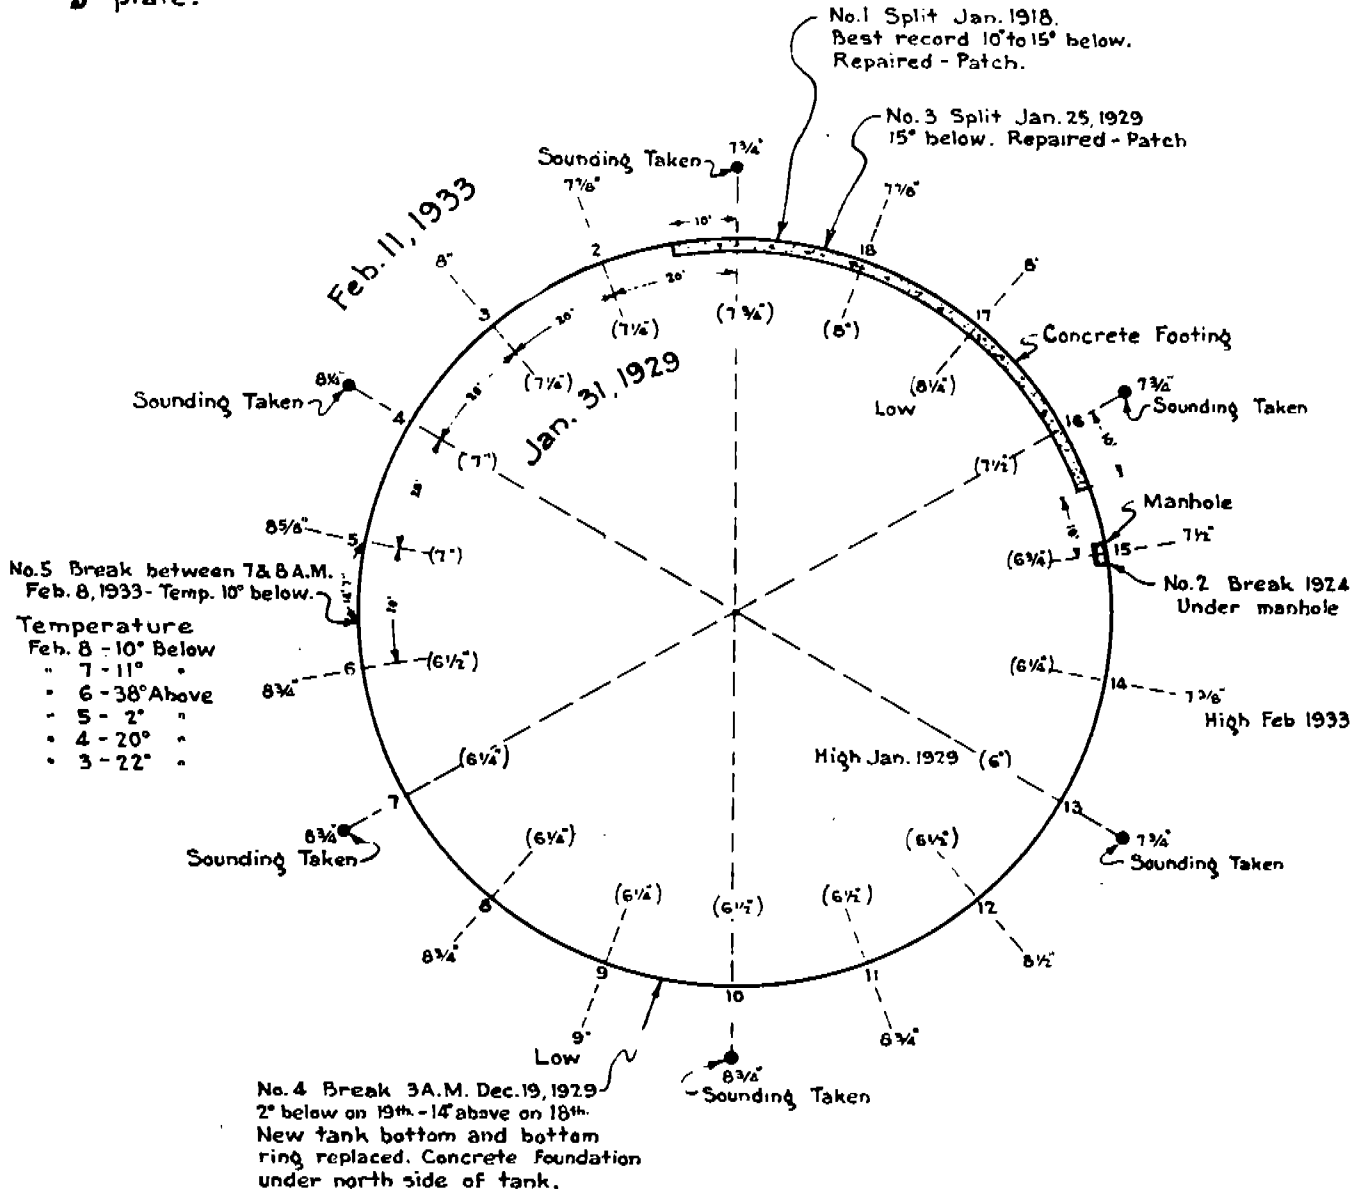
Failures in riveted crude oil storage tank No. 1
